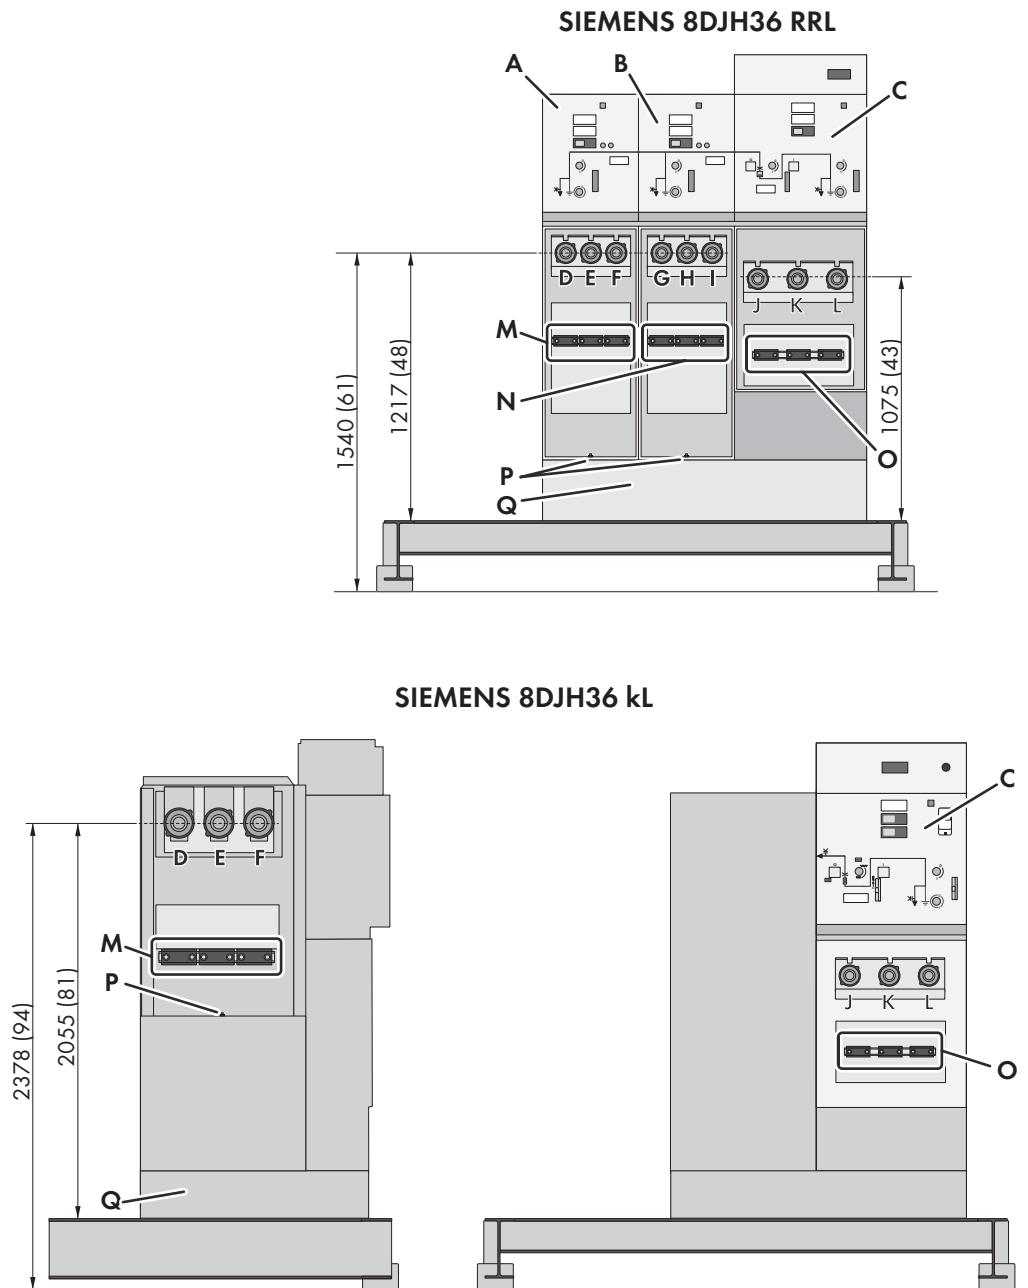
Connection area of medium-voltage switchgear (example) (Dimensions in mm (in))
